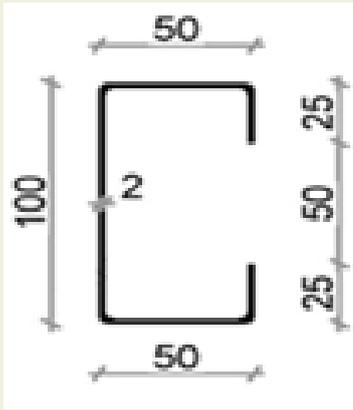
Dimensions of Dip Galvanised Steel with C Profile Structure [22]
